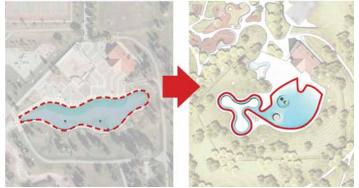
REBUILT WADING POOL WITH NEW LAZY RIVER
